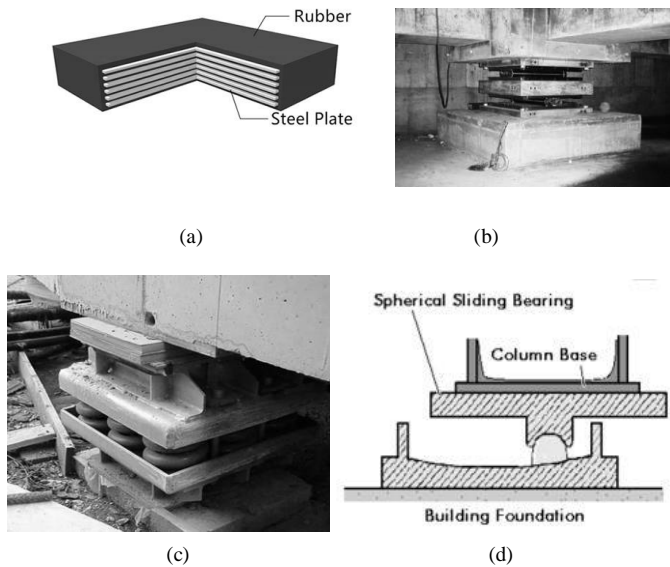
(a) Laminated elastomeric bearing pad internal structure. (b) Housing complex mounted on roller bearings (c) Spring Isolators (d) Spherical Sliding Base Isolator
